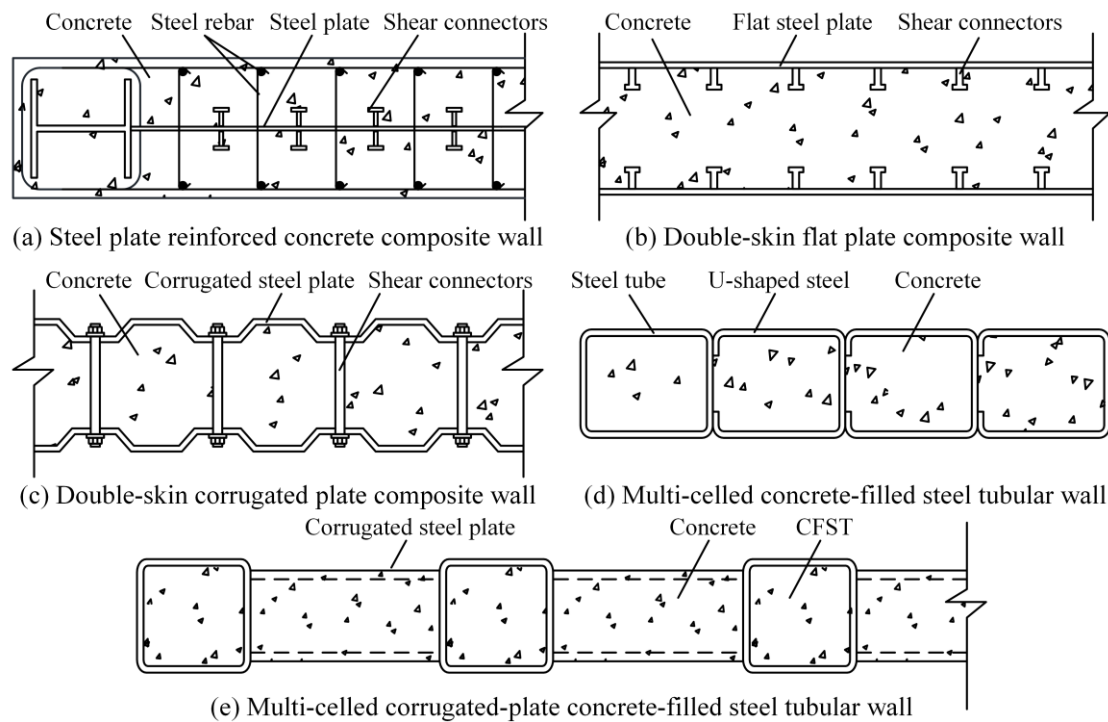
Application of steel-concrete composite walls in practice [16, 17].
